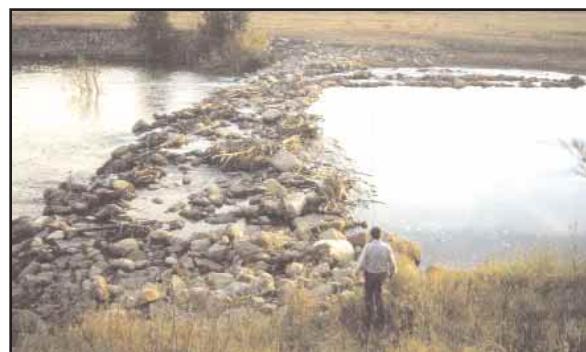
A mangfall sill with central fishway (photo by John Harris).
